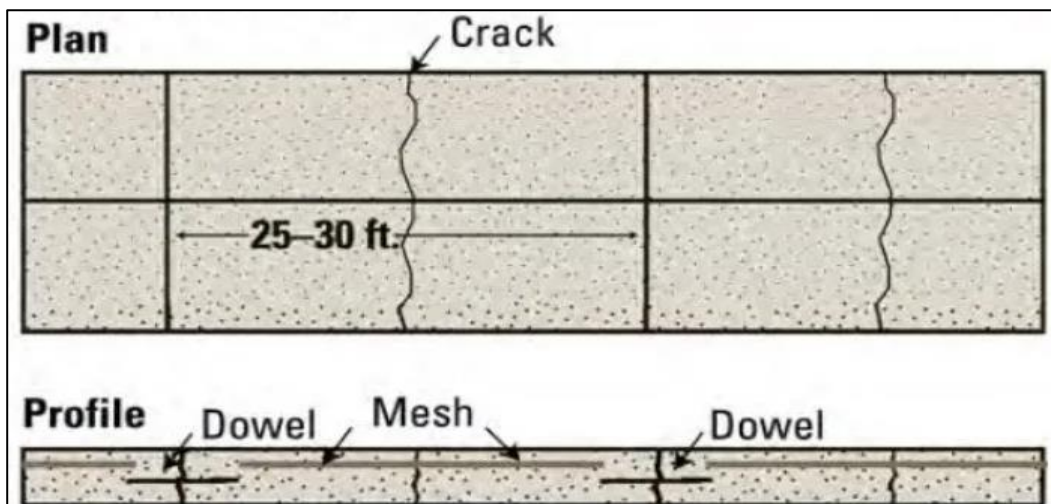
cross section of Joint Reinforced Concrete Pavement (JRCP)
